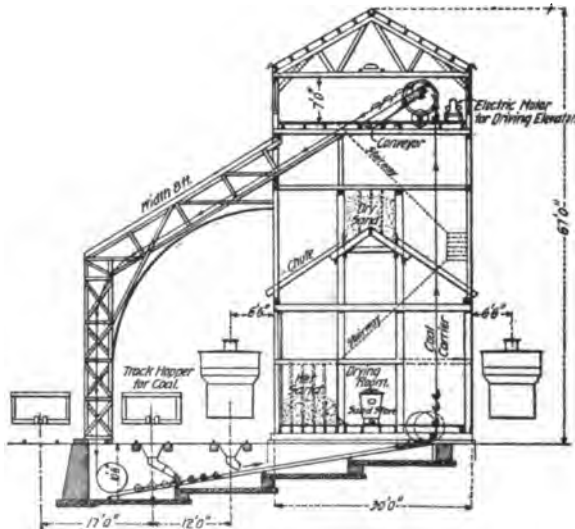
Cross-section of Coaling plant, Jersey City—Erie Railroad.
